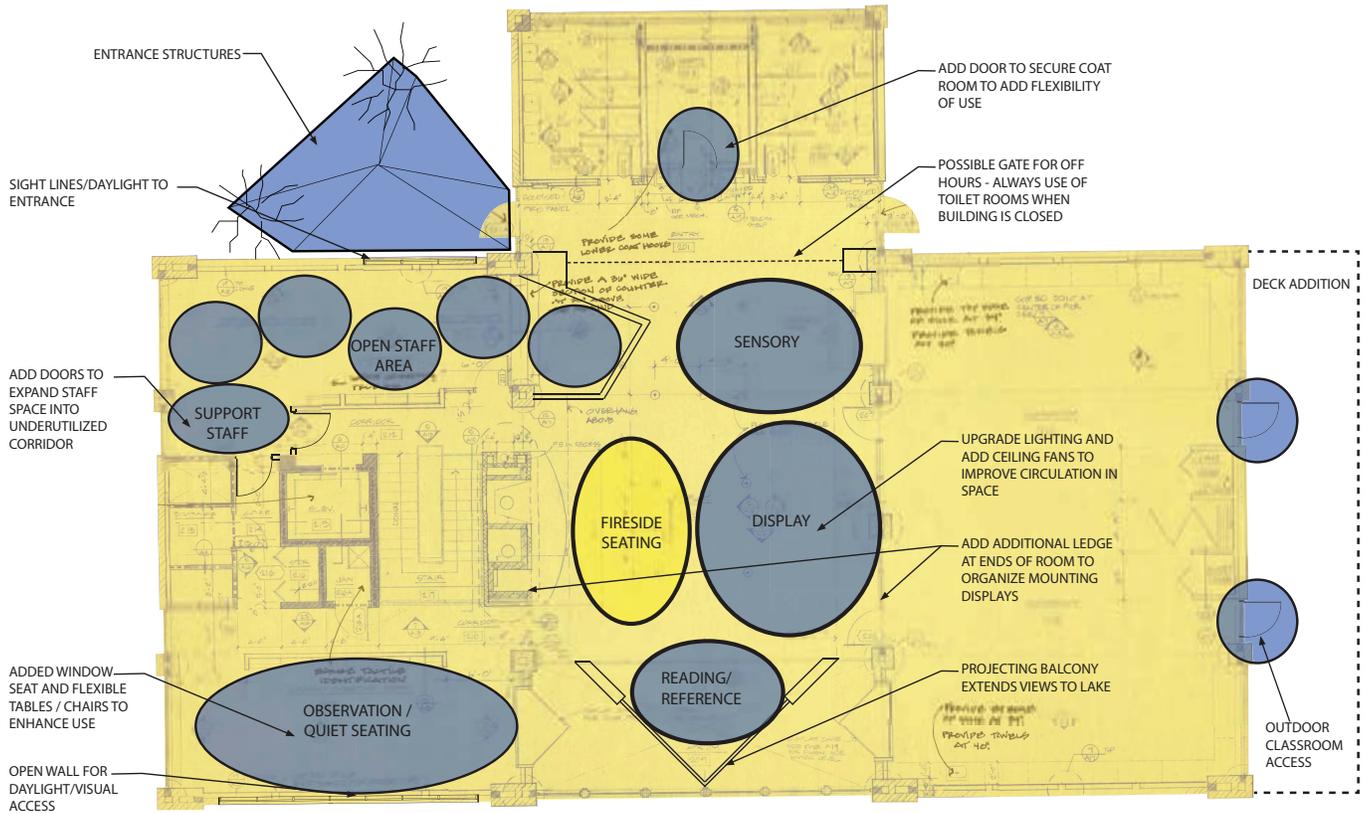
Building Improvements Concept Plan -Lower Level
